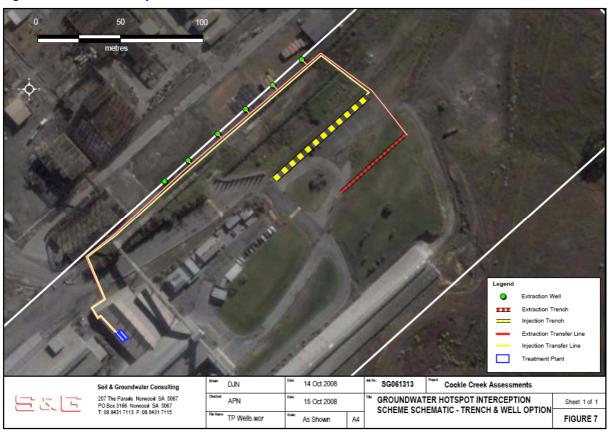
provides a plan of the proposed treatment system of the groundwater facility.
